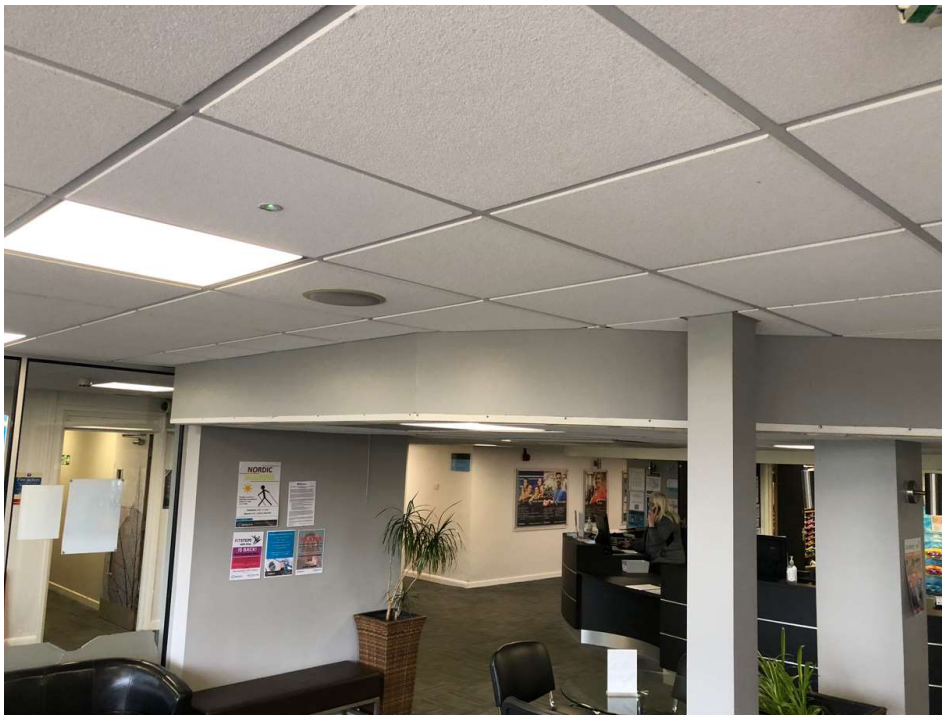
Main reception. The lower area is part of the original building and is a concrete frame. In the foreground, where the ceiling is higher, it is a steel frame extension with a timber joisted flat roof.
